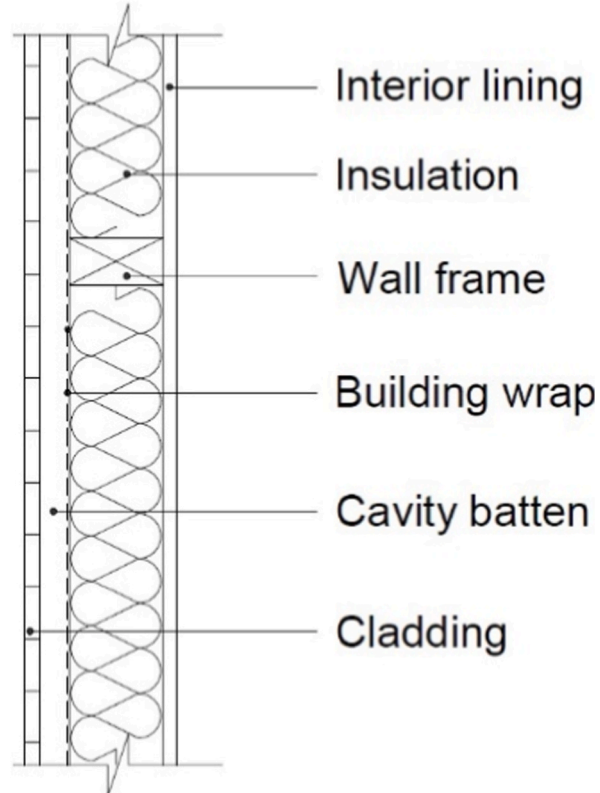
Cross-section drawing of a typical timber framing wall in NZ.
